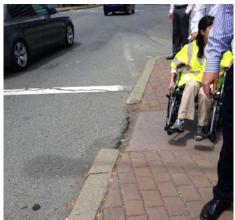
North crosswalk of Buskirk Avenue typifies some of the existing curb ramps with uneven surfaces difficult to traverse for those with mobility impairments.
